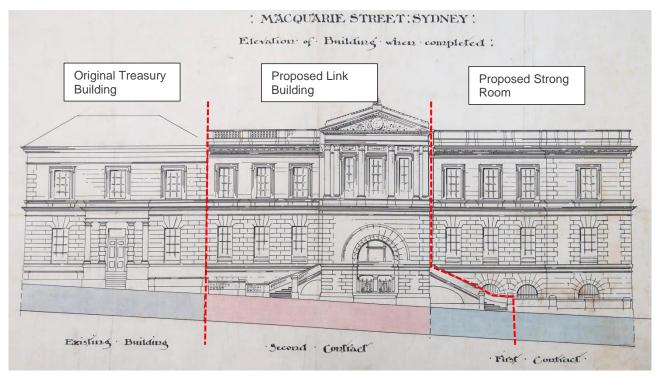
Extract of Architectural Plan for Proposed Additions to Treasury (proposed north wing including a Strong Room and Link Building)
